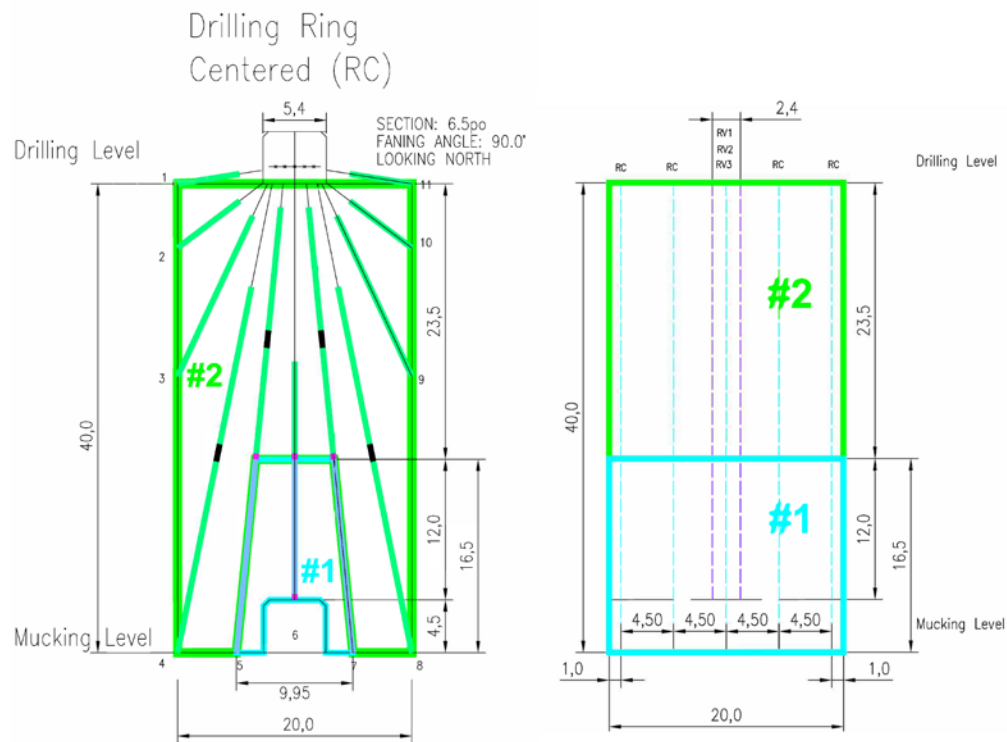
Typical drilling and blasting pattern for levels L870 to L1110
